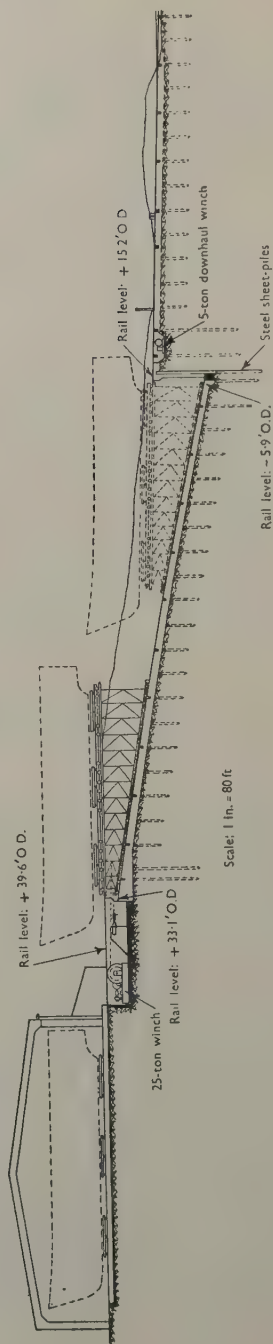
DETAILED ELEVATION OF SHORE END
